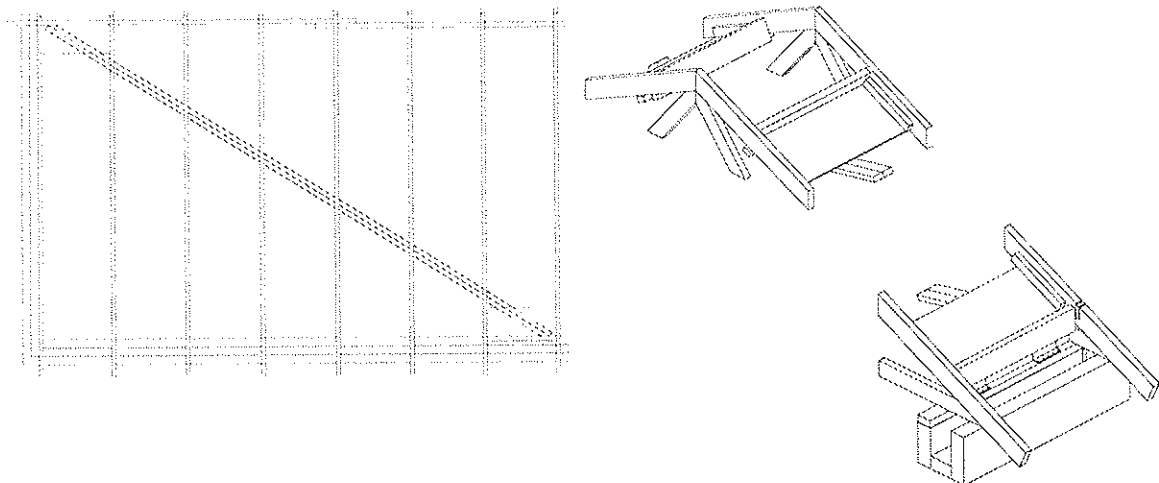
Bracing system for small span trusses based on a cross bracing from ridge to foot. The cross bracing is assembled from two battens and connected to the lower side of the truss heads and to plywood plates at the ends. A stringer near the ridge is also connected to the plywood. At the foot the head beam of the wall serves as stringer. The battens (not shown) function as lateral bracing. The force is transferred to the cross bracing via twisting and bending of the truss head. The twisting of the truss heads is prevented by pieces of planks mounted between two heads, whereas the bending is permissible due to the unused strength from the systems effect.
